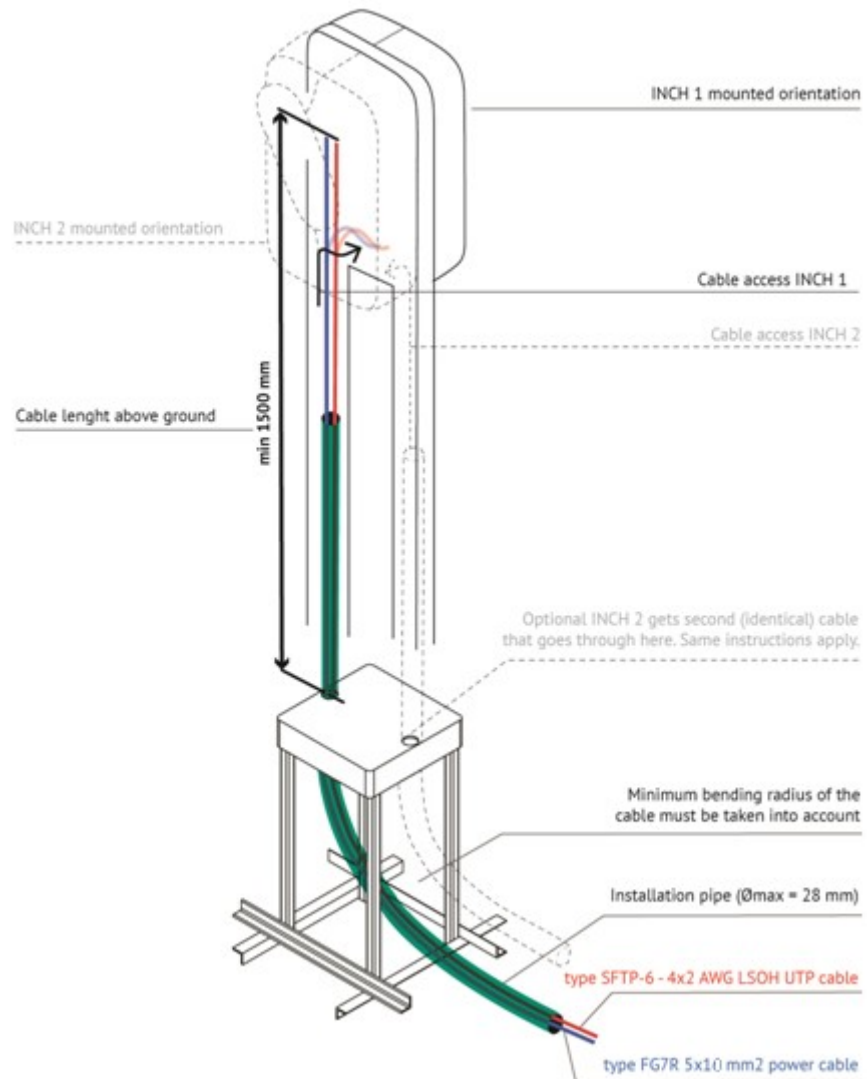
Installing of installation pipe through concrete base and installation of power cable into installation pipe.
